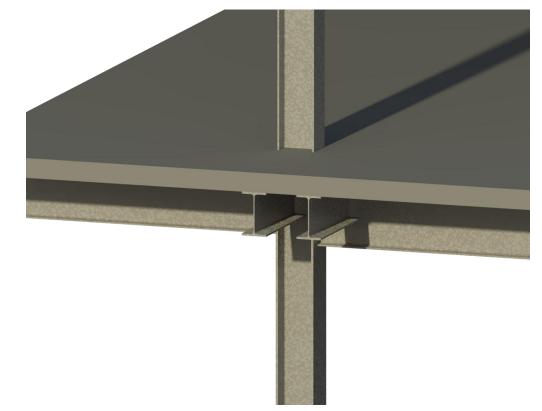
CLOSE-UP POUR STRIP SLAB & STRUCTURE CONFIGURATION
